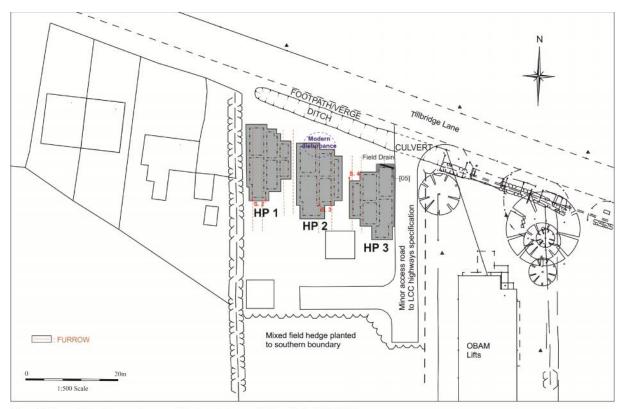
General plan of excavation area. Site layout plan supplied by client. 1:500@A4
